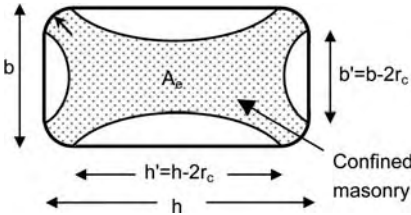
Effectively confined masonry in columns with rectangular cross section.
